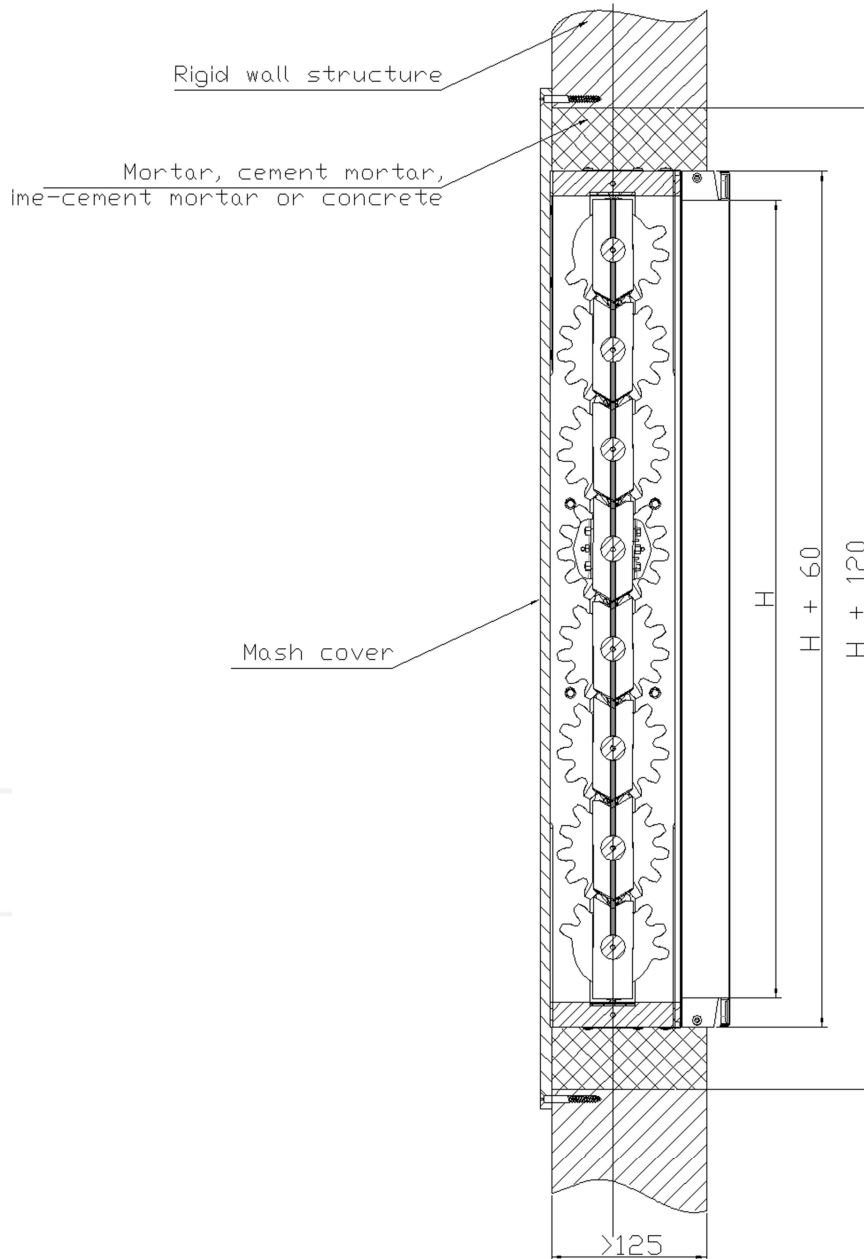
Installation method of fire dampers WKP-P in structures thicker than 125 mm
